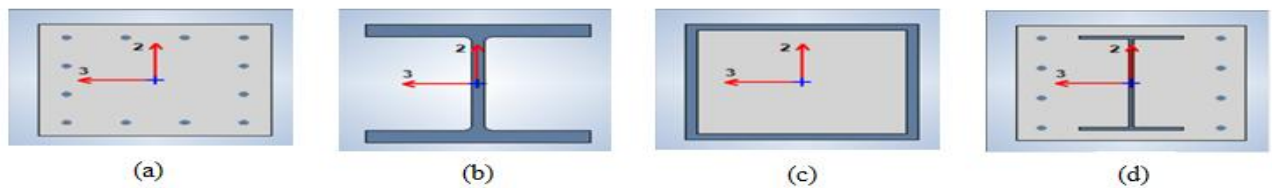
Column section properties: (a) R.C.C.; (b) Steel; (c) CFST; (d) CES
